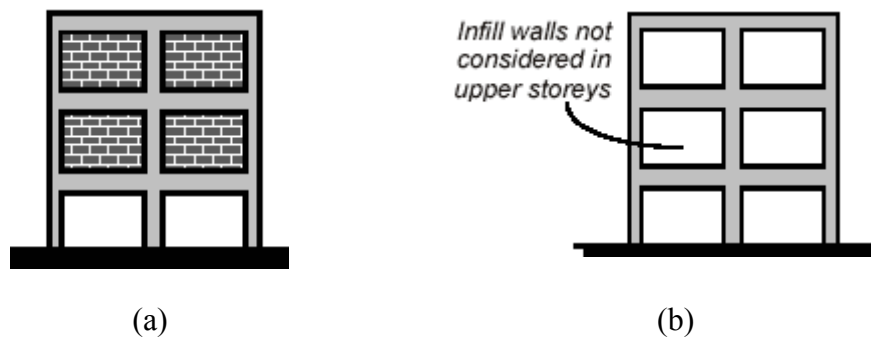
Buildings with open ground story (a) actual building (b) building being assumed in current design practice
